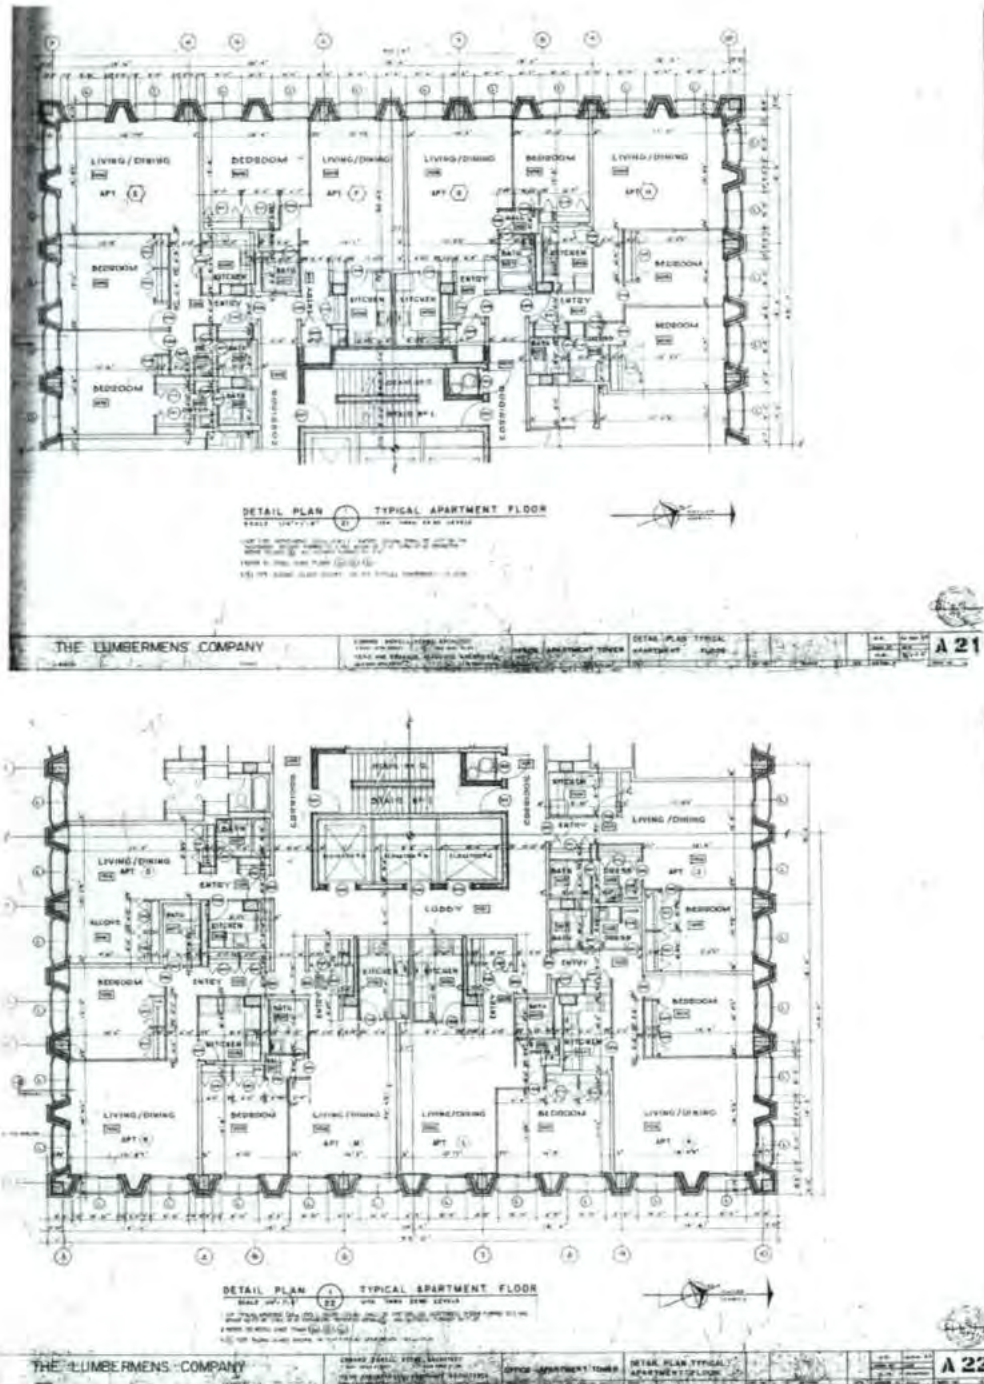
Detail plans for typical apartment floors, levels 11-22.
